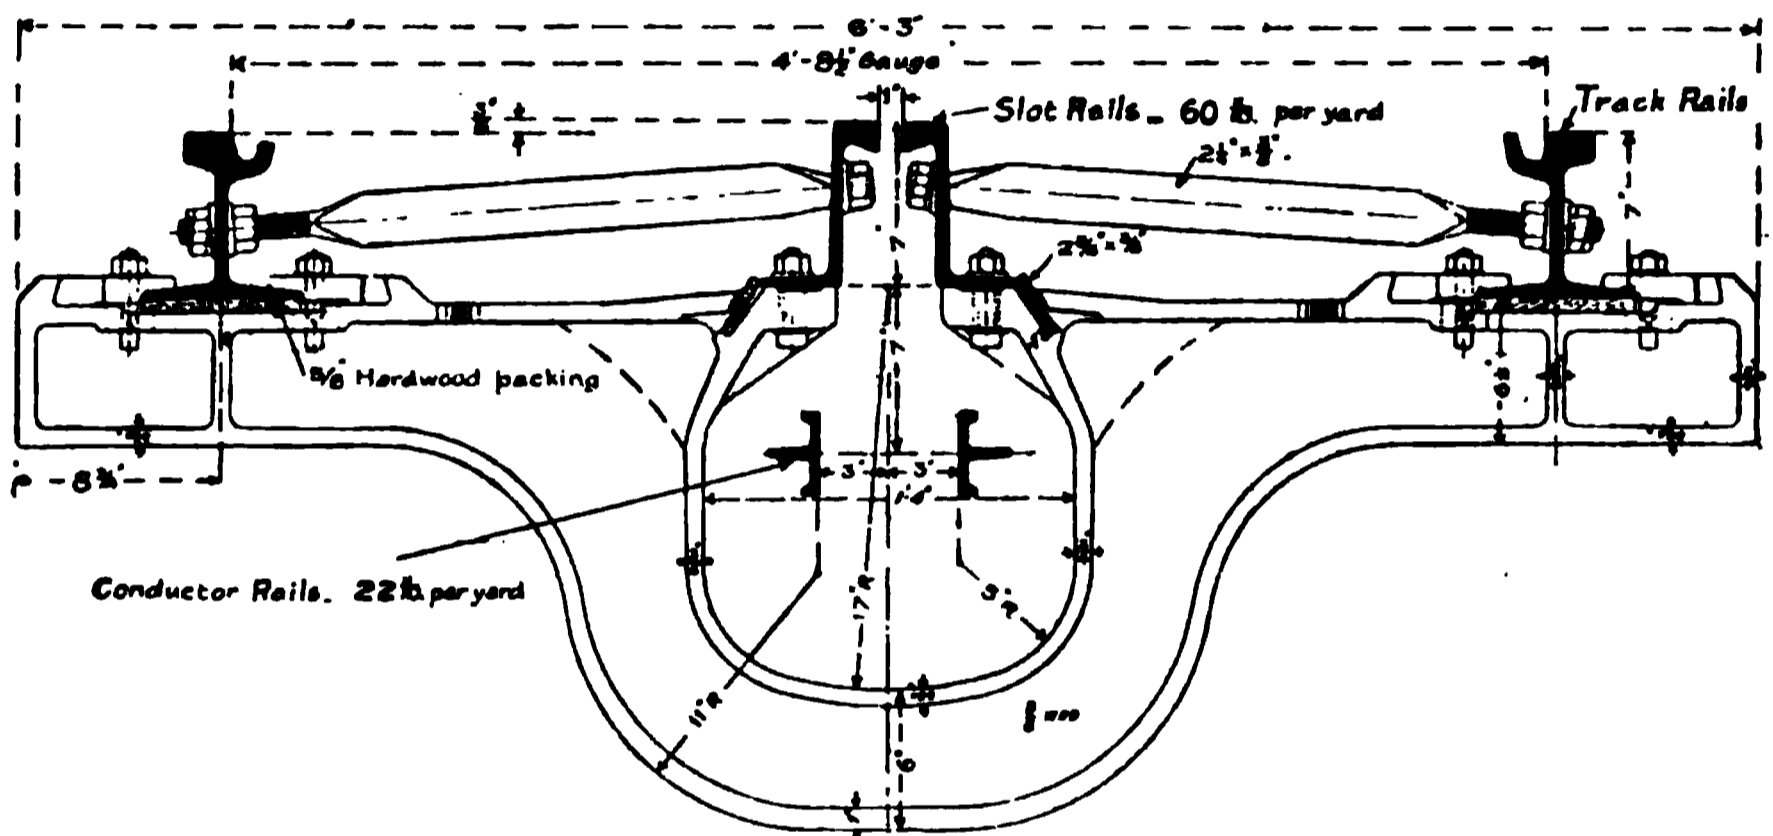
Extended Yoke, L.C.C. Conduit Tramways. [Track rails: B.S. Section No. 4—105 lb. per yard.]
